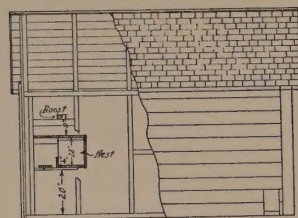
SIDE VIEW SHOWING CONSTRUCTION
